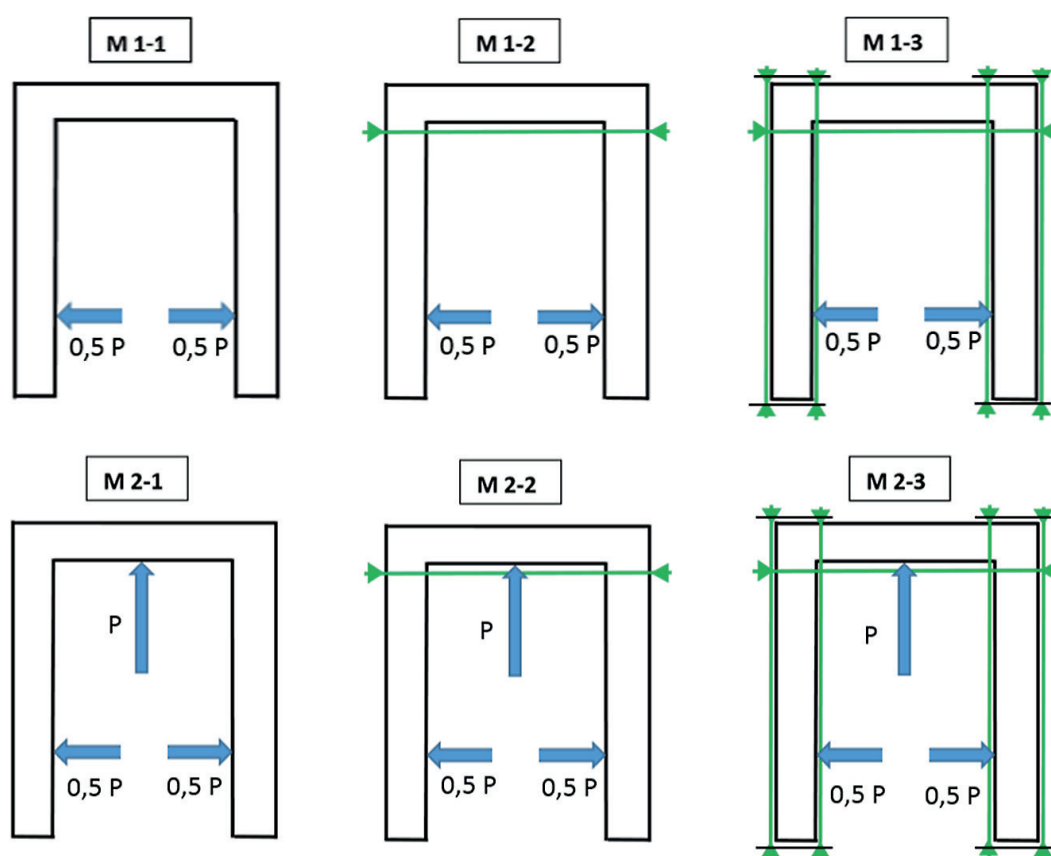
Stages of reinforcement and testing of experimental reinforced concrete models
